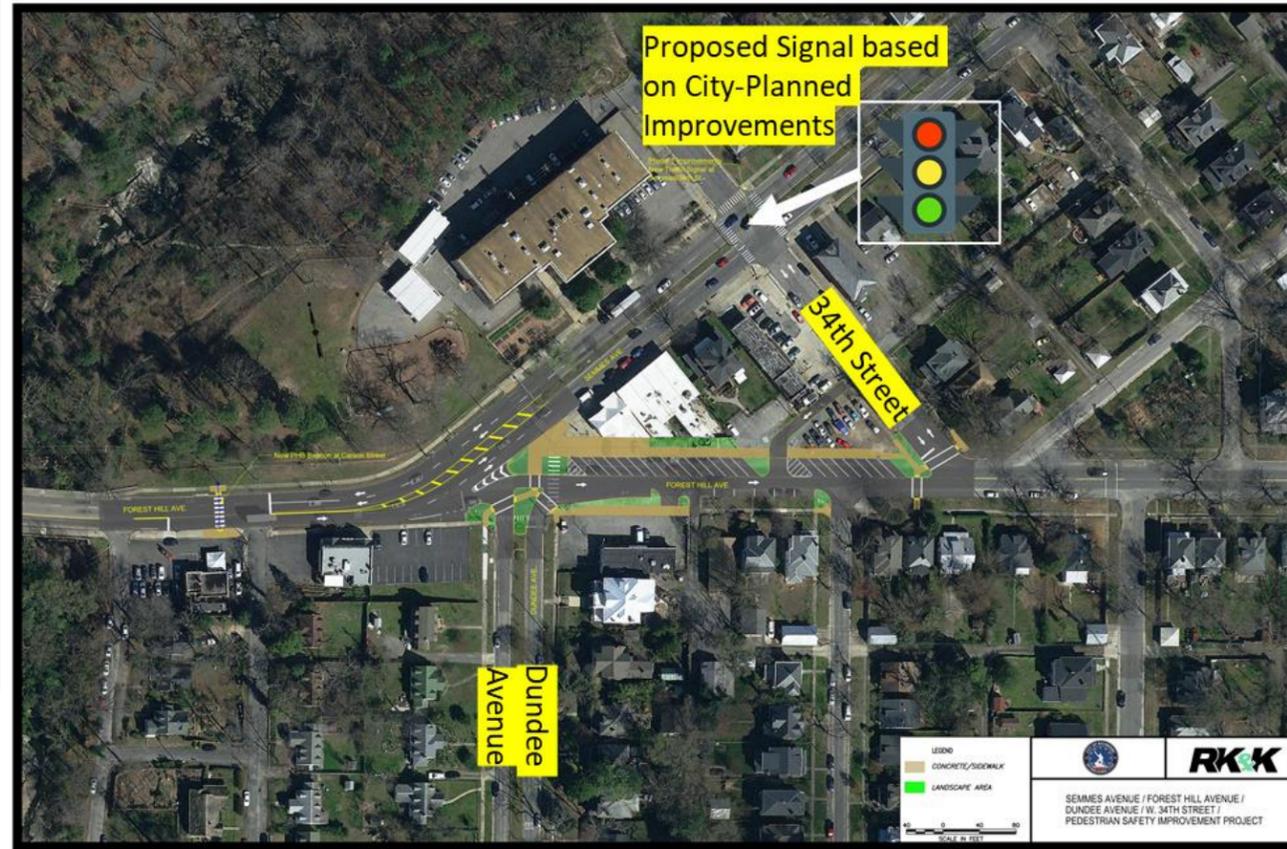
Route 60 - Planned Improvements between Dundee Avenue and 34th Street
